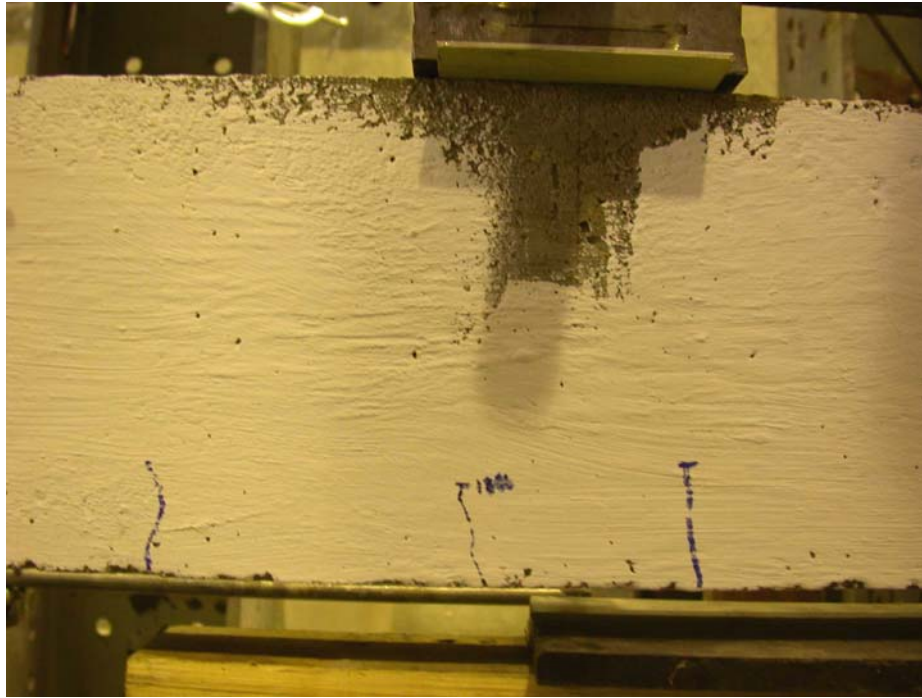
Beam P-1 Cracking at 1800 lb.
